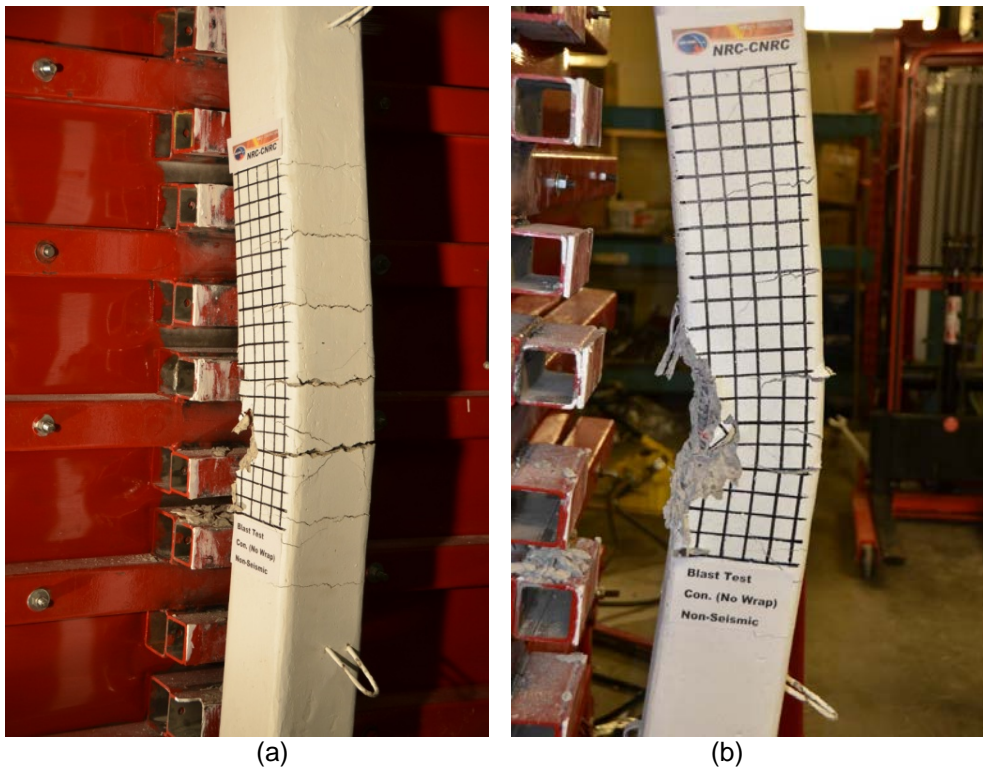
Level of damage of column As-built Col. front view b) side view
